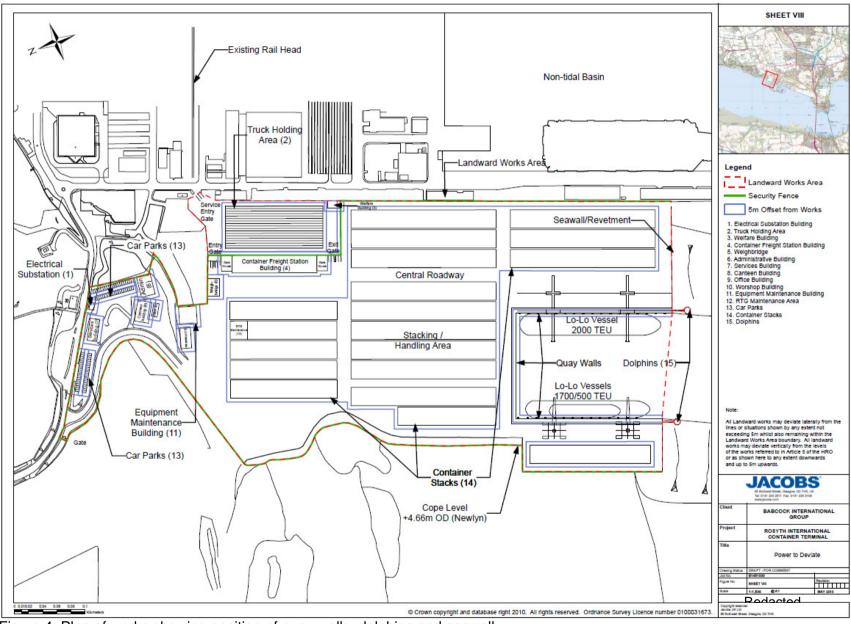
Plan of works showing position of quay walls, dolphins and seawall.
